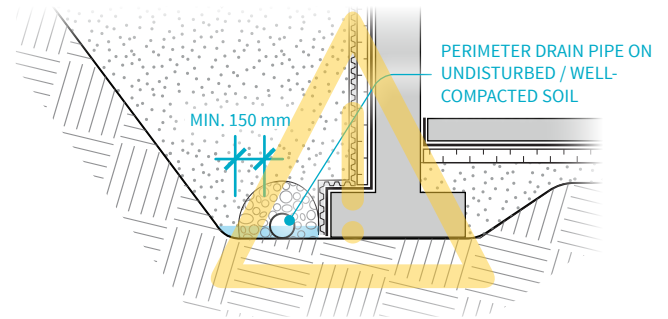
Example of BC Building Code drain pipe option (9.14.3.) for foundation drainage system; not recommended for best practice (does not allow for gravel bedding).
